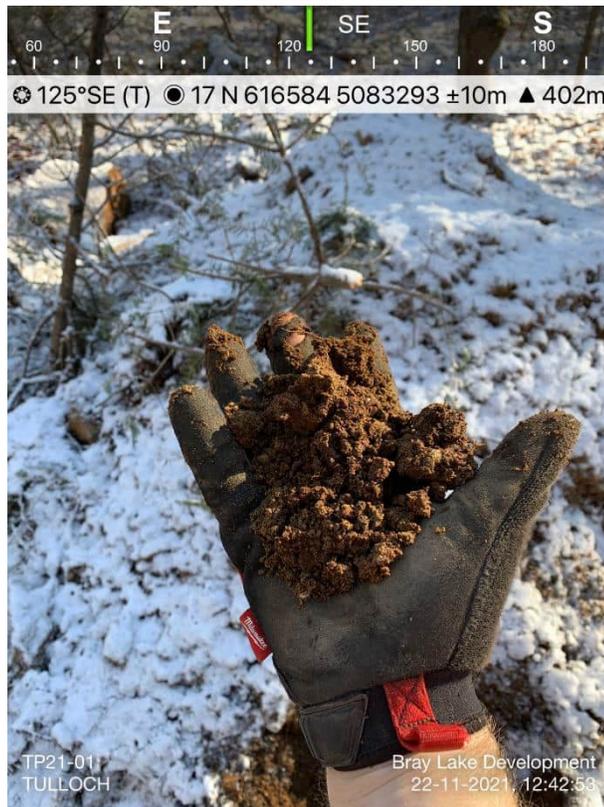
Typical sandy soil encountered at all Test pit locations contained gravel, cobbles and boulders
